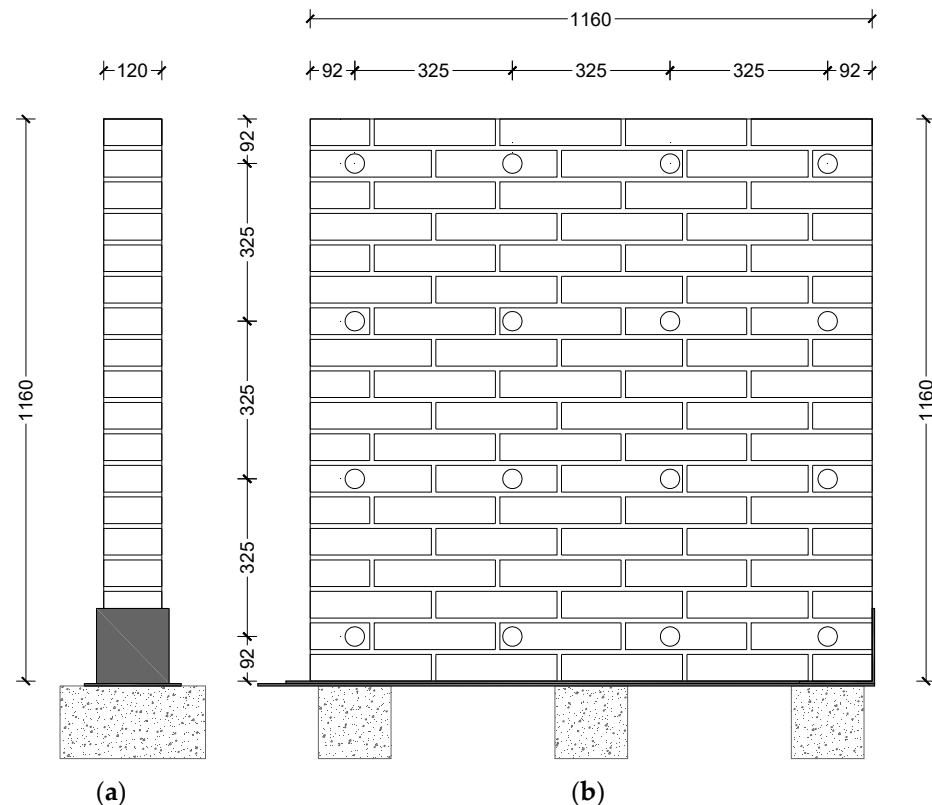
Geometric characteristics of the single-headed masonry specimens (all dimensions in mm): (a) side view; (b) front view.
